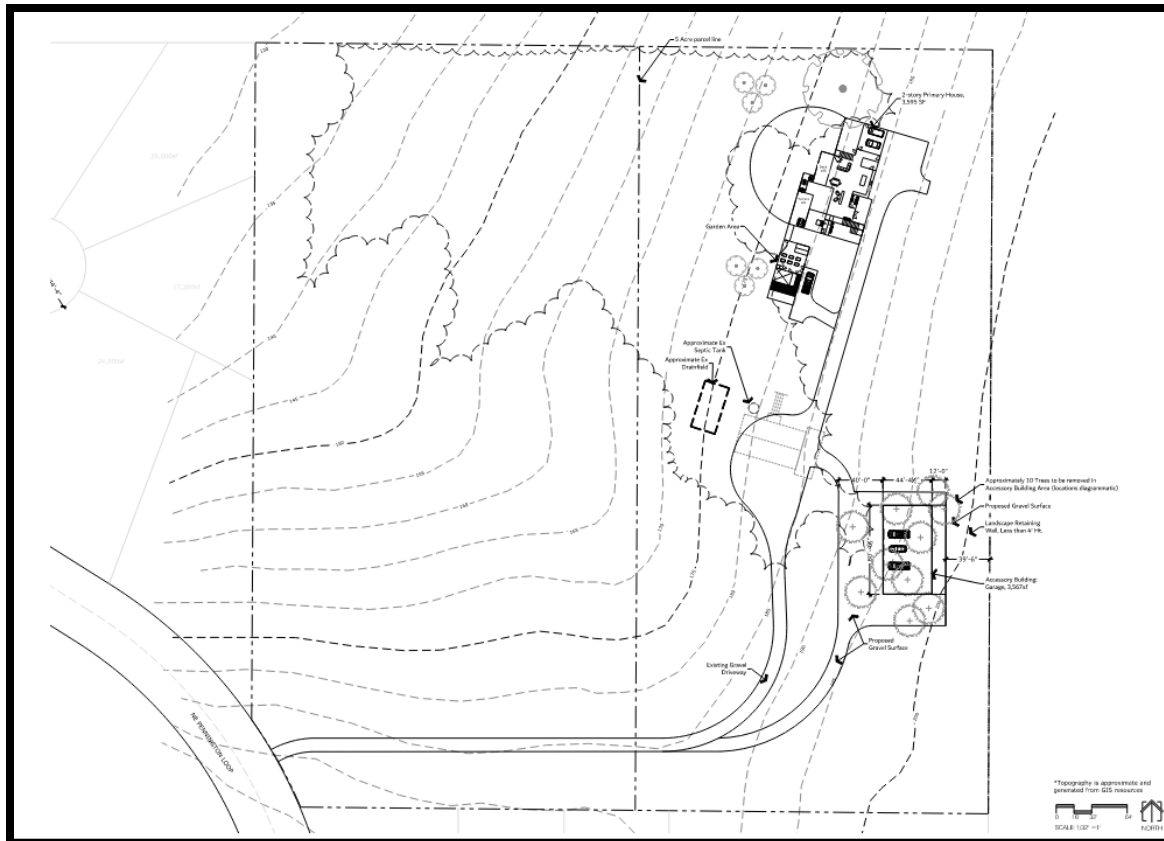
Site plan for parcel showing future house at the top and garage near the bottom.
